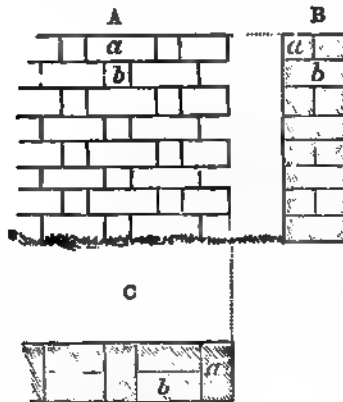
Represents an elevation A, and view B, and plan C, of a wall arranged as headers and stretchers.
